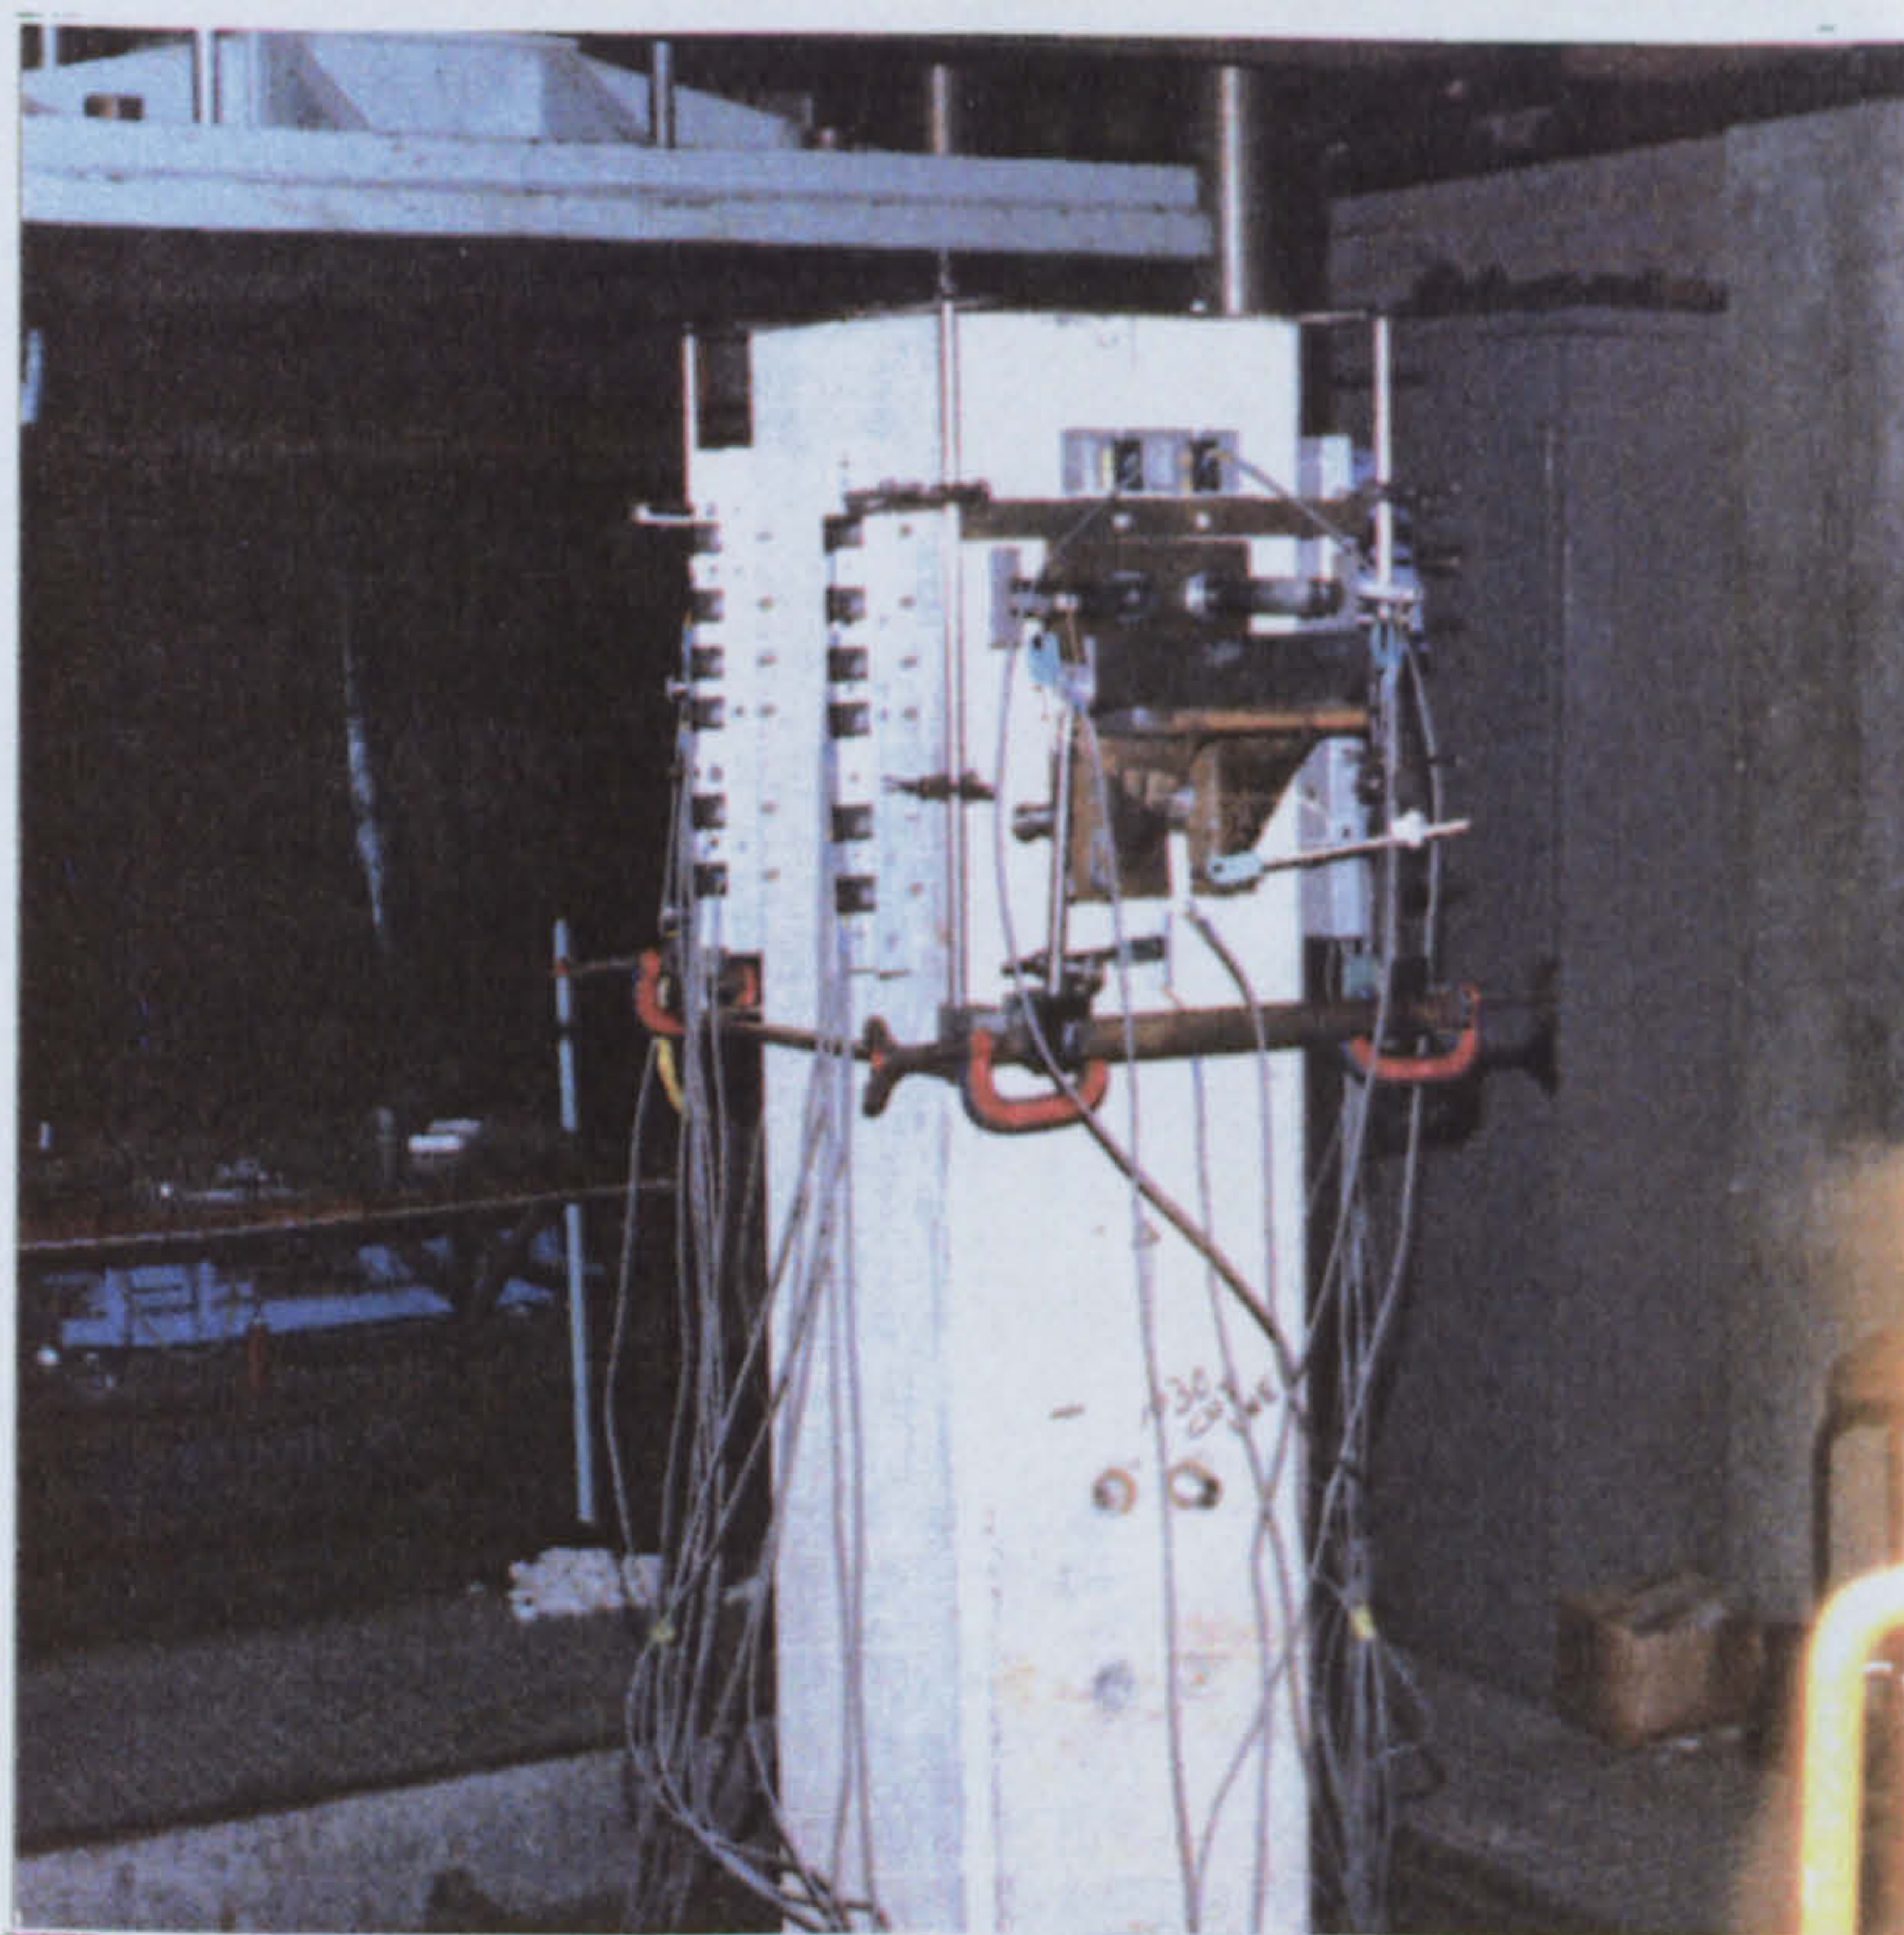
VIEWS OF TEST ASSEMBLY FOR THREE- AND FOUR-BOLTED
